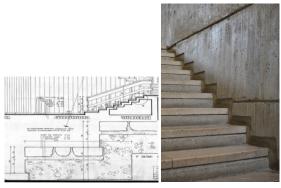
Reinforced concrete stairs cladded with marble units connected with a "negative skirting"
